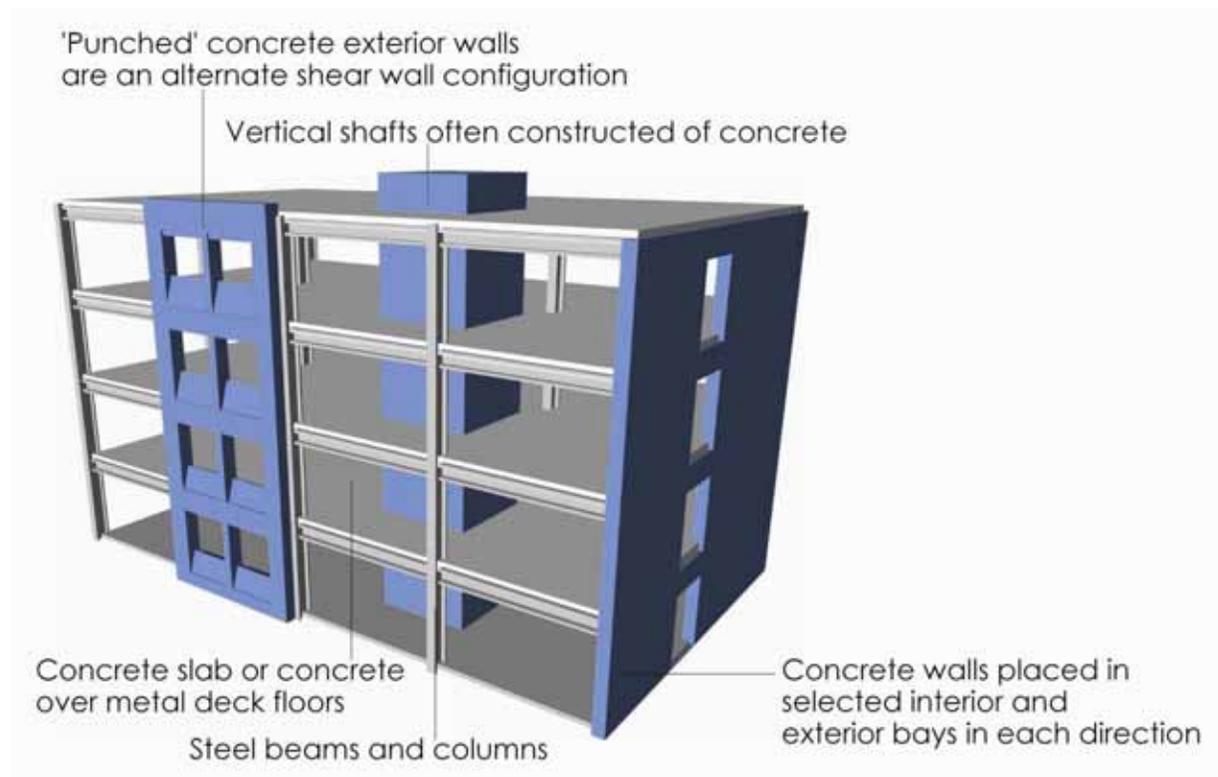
Building Type S4: Steel Frames with Concrete Shear Walls
